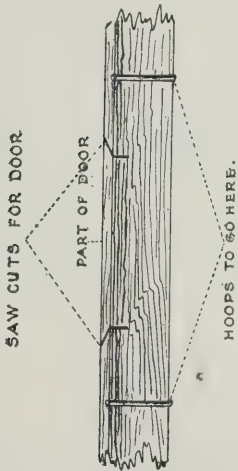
Part of stave showing saw cuts to be made for a door before erecting stave.
